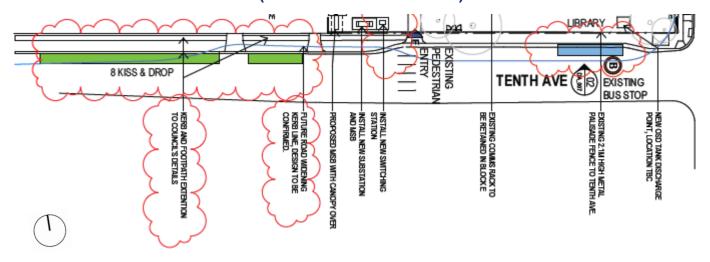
Extract from overall site plan showing kiss and drop bays on Tenth Avenue (Source: Pedavoli Architects)
